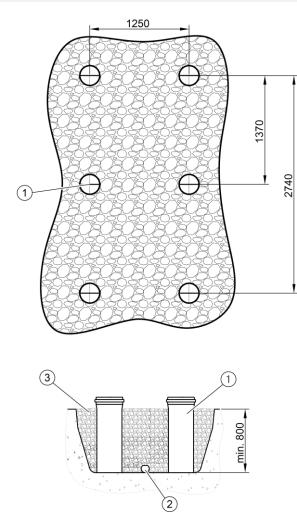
Point foundation for VHS 80 evaporator (in mm)
